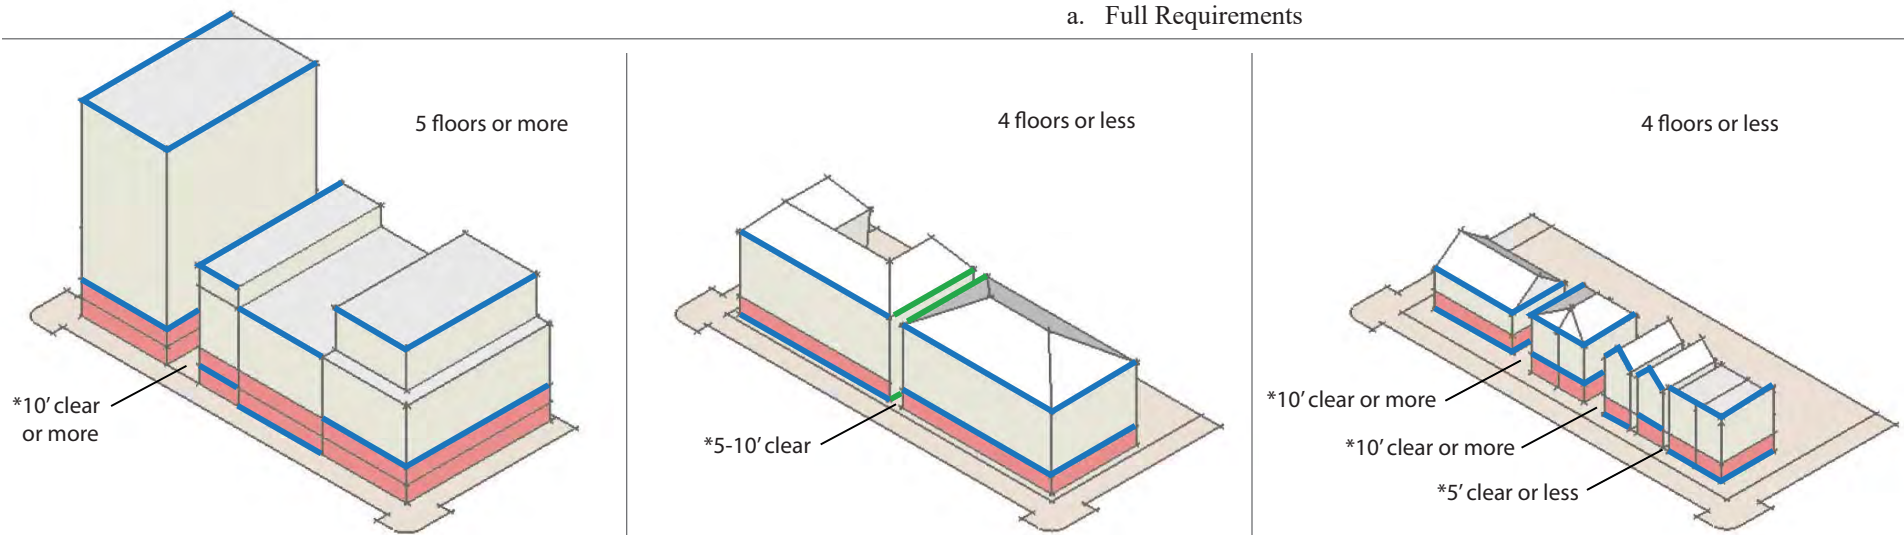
B. STREET FAÇADE BASE AND TOP REGULATION
